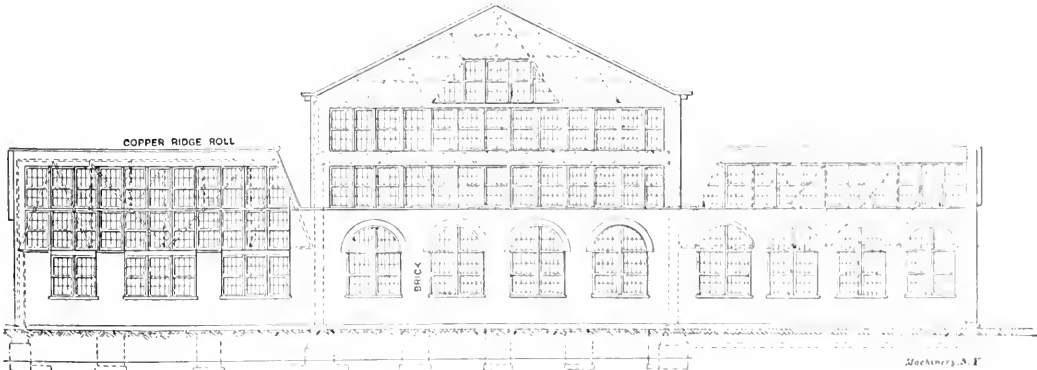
End View of Shop showing Passage-ways between Saw-tooth Roof Sections and Side Walls of Erecting Shop
